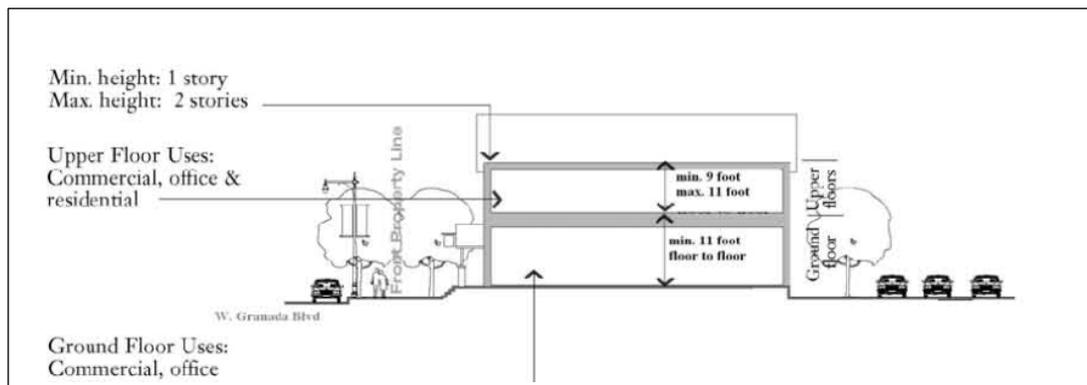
2-Story Building x Section Typical *(No change to existing text...)
